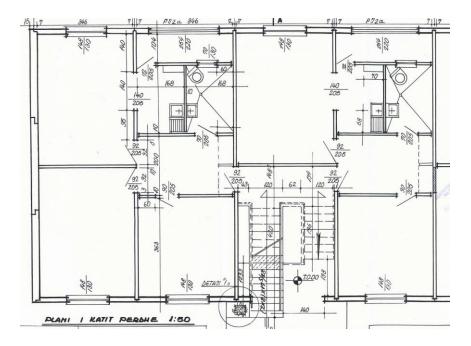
Ground (typical) floor plan of prefabricated panel housing – Section 1. Image source: Central Technical Archive of Construction
